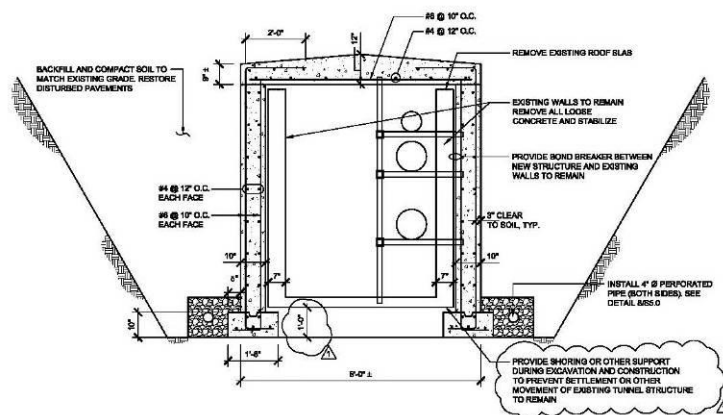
Repair Option 3, structural replacement with original walls to remain.
